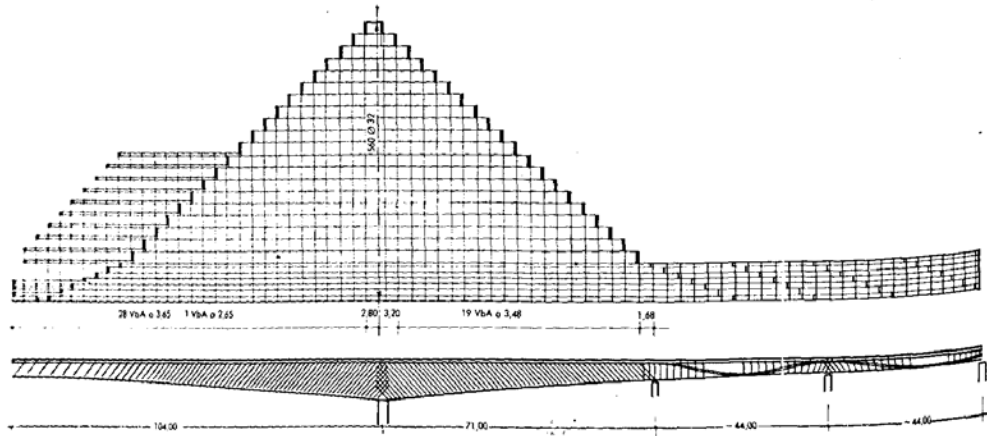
Section showing prestressing tendons in webs (Finsterwalder 1965)
